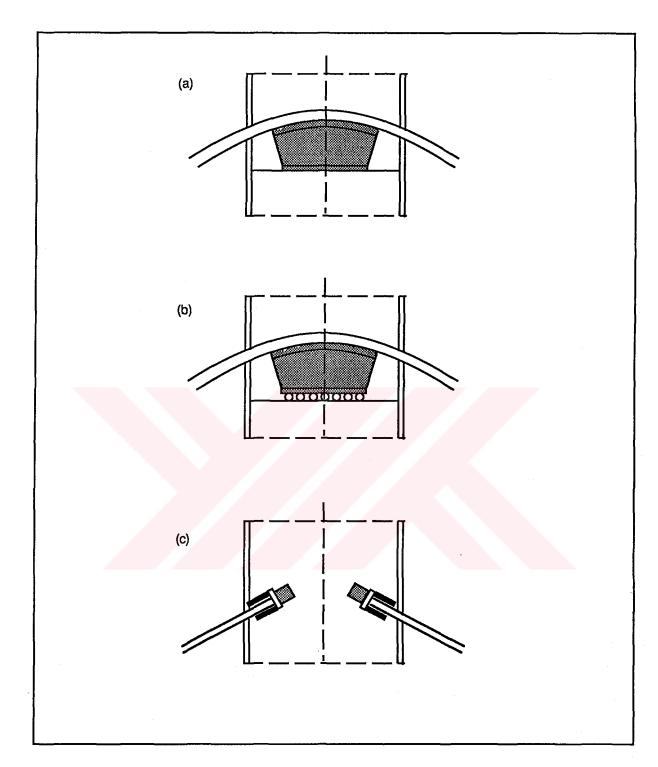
THREE TYPES OF CONNECTION BETWEEN CABLES AND PYLONS
